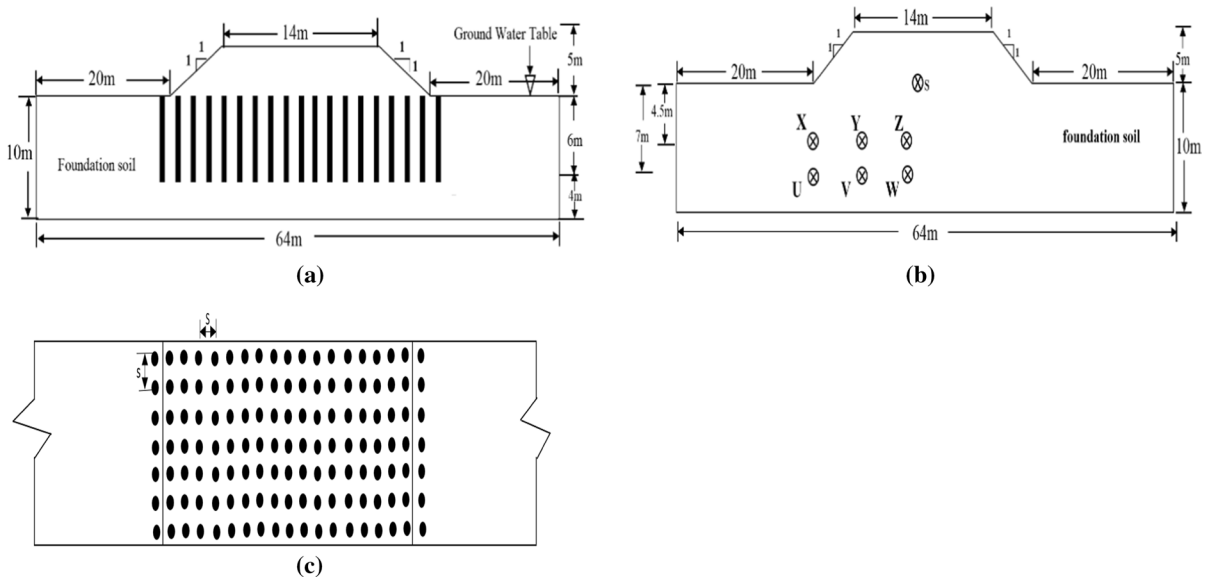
a Embankment constructed on consolidating soil with columns considered for the study. b Figure showing the salient points considered for studying displacement and pore pressure. c Plan showing position of columns in foundation soil
